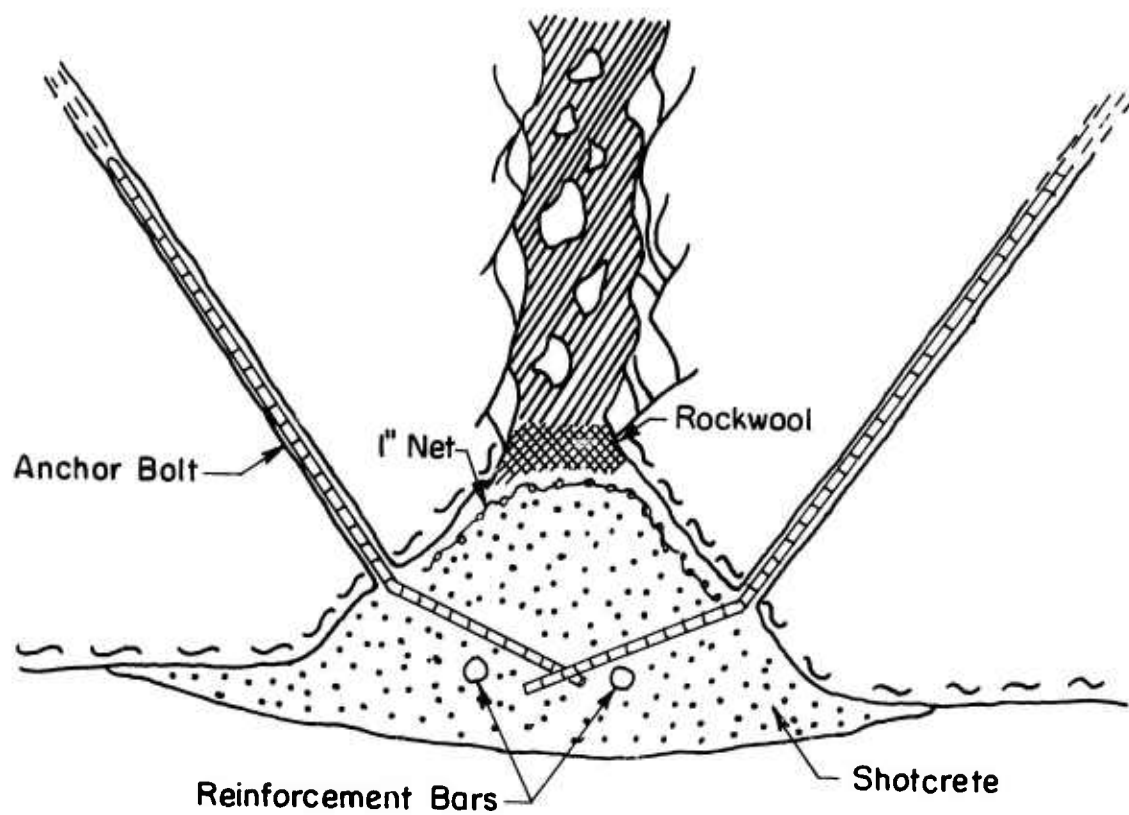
METHOD OF SEALING SEAMS WITH REINFORCED SHOTCRETE
